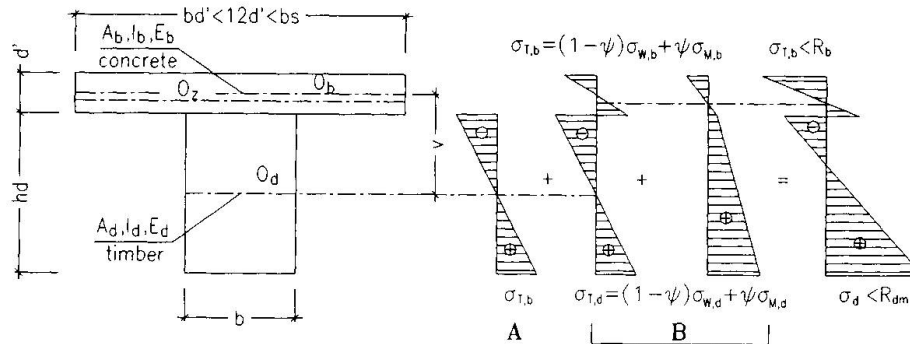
The distribution of stresses in concrete slab and timber joist:
